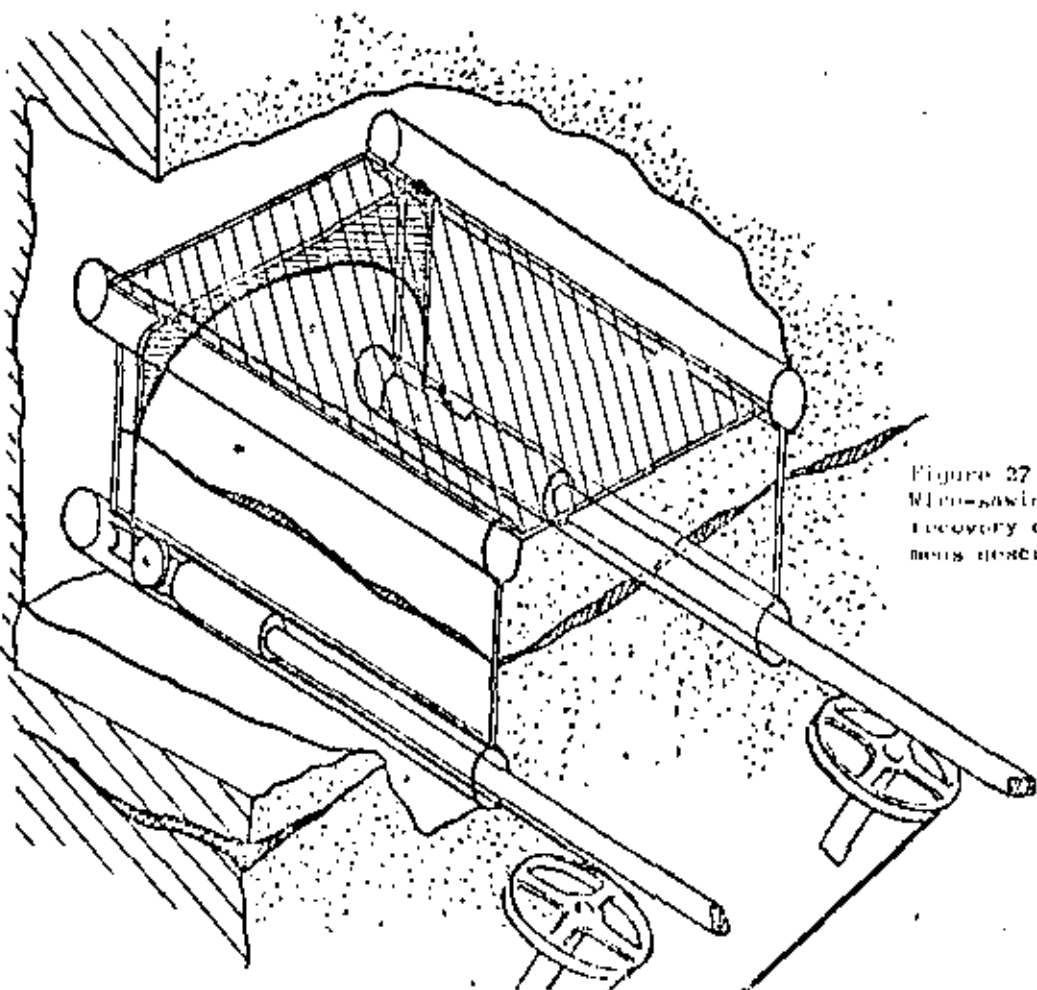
Wire-sawing technique for the recovery of shear test specimens described by Imdo 74.
